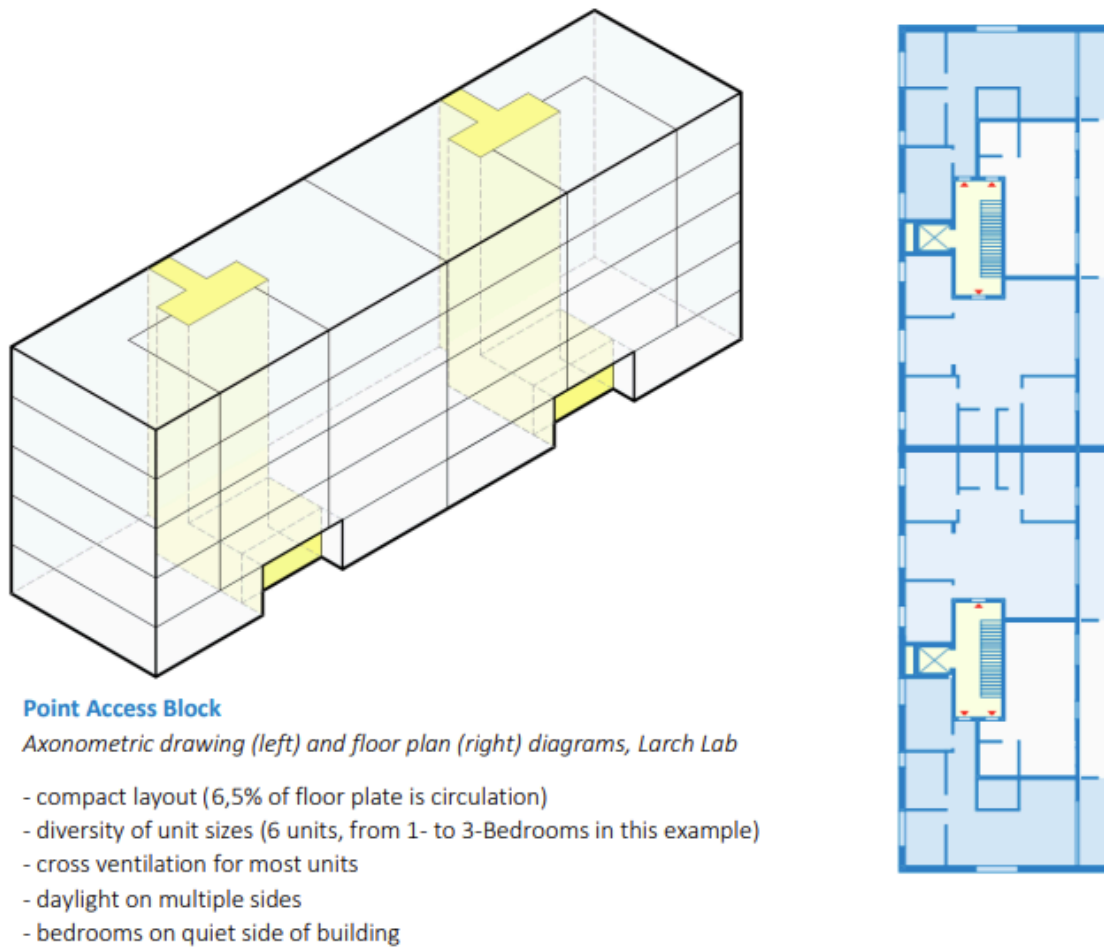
Example drawing of common single-staircase building(s) layout (also known as point access blocks).
